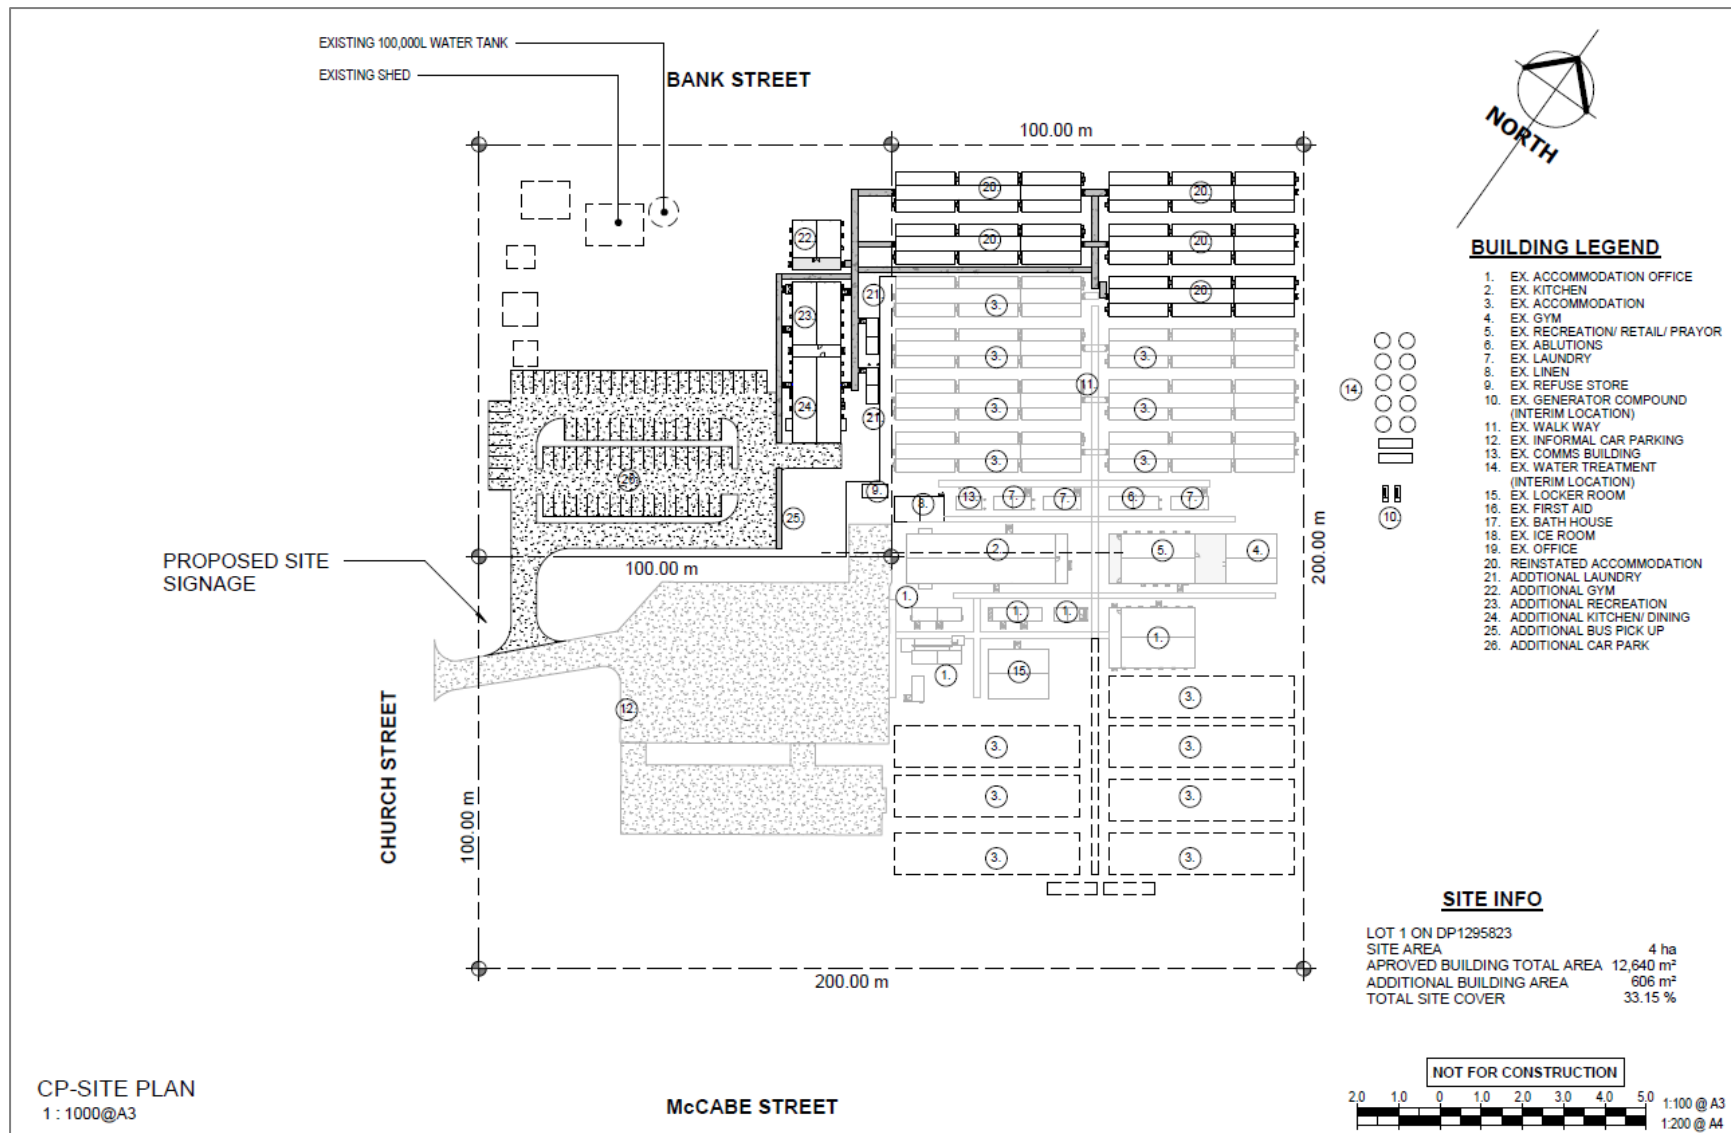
Iluka temporary off-site construction camp – conceptual plan – existing and proposed facilities
